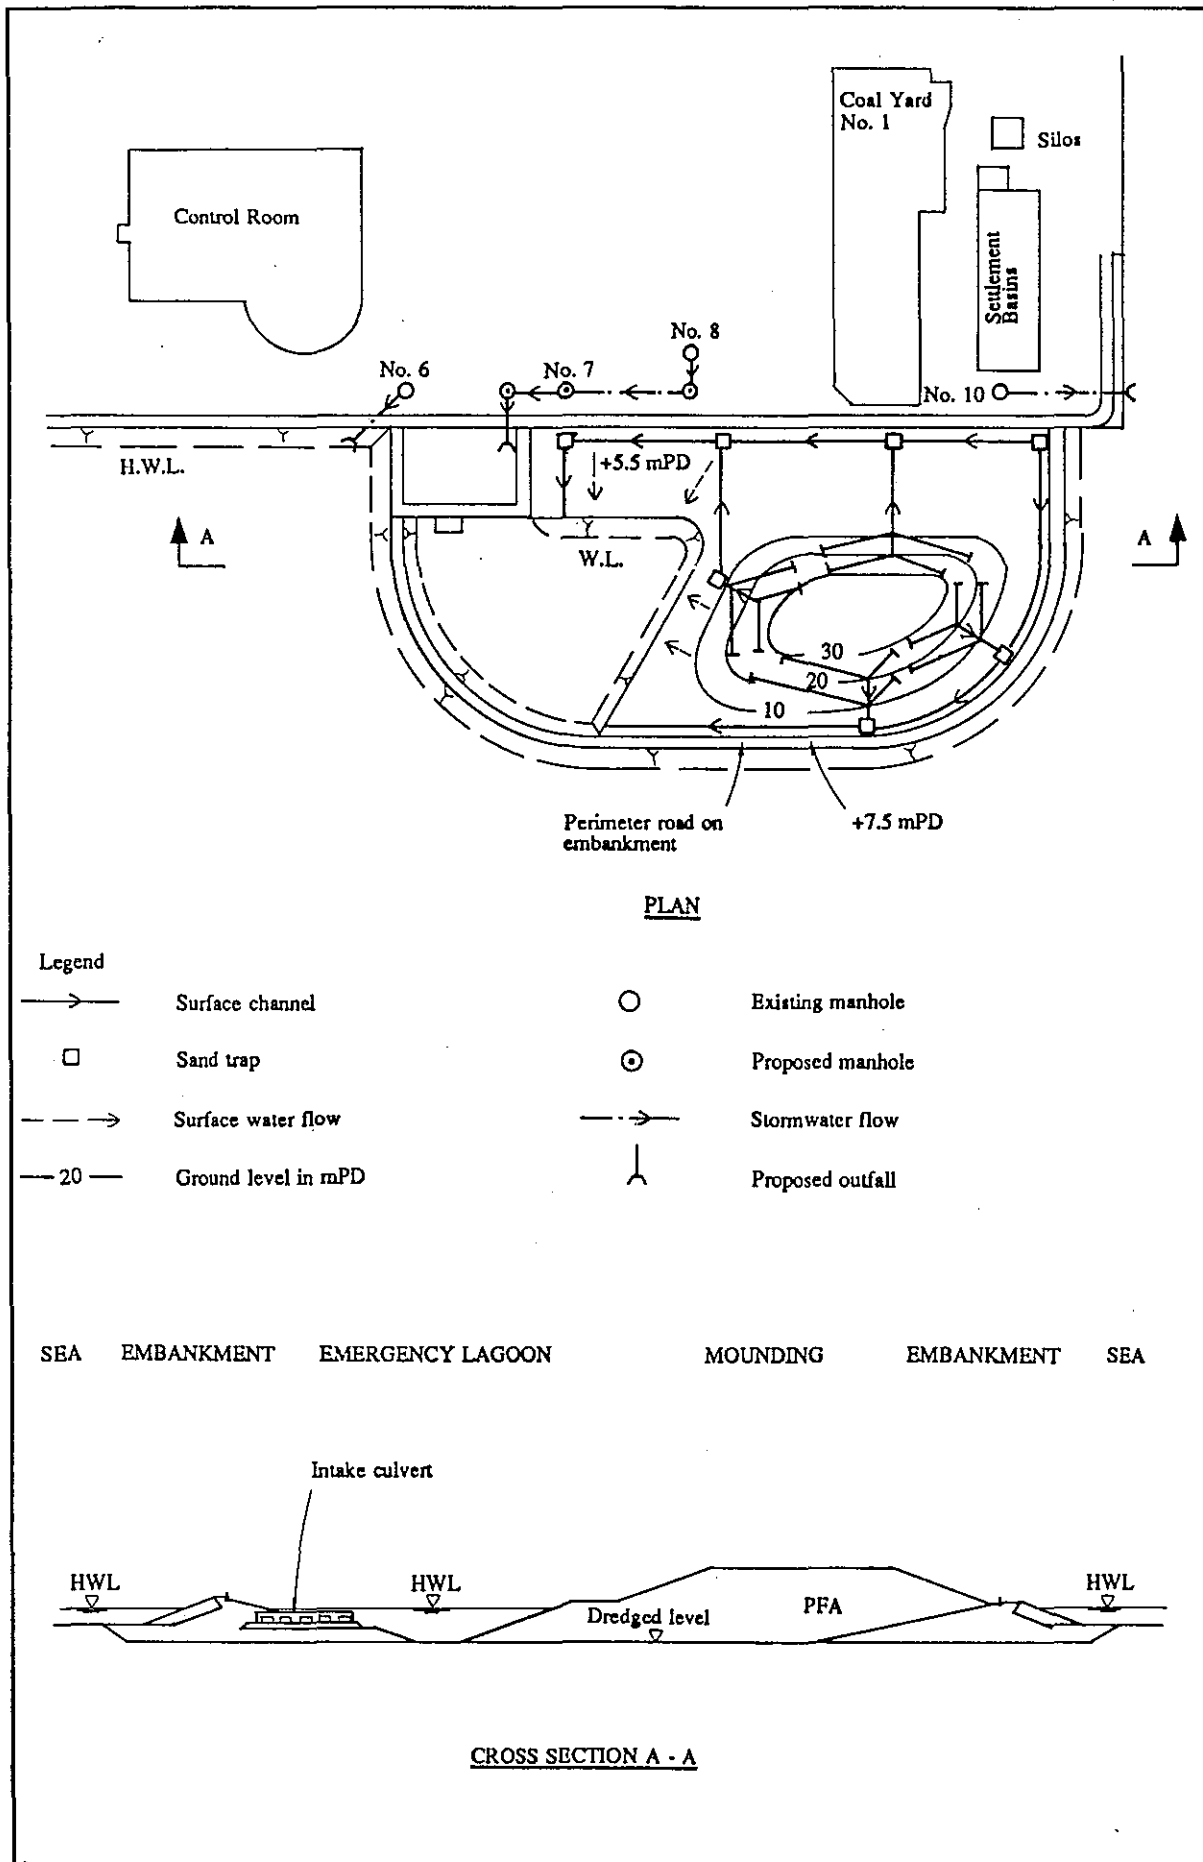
Completed Lagoon and Mound (Including Drainage Plan)
